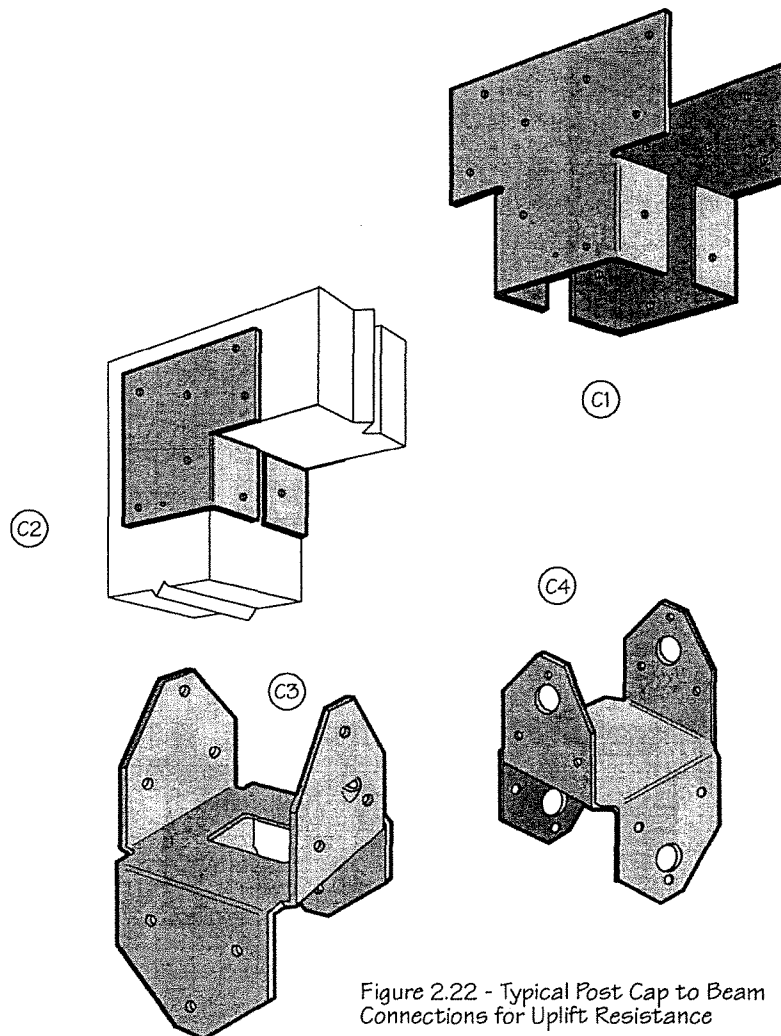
Typical Post Cap to Beam Connections for Uplift Resistance
